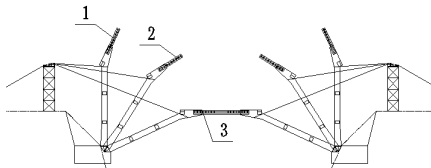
Downrotating vertically construction technology of the rigid-frame arch bridge
